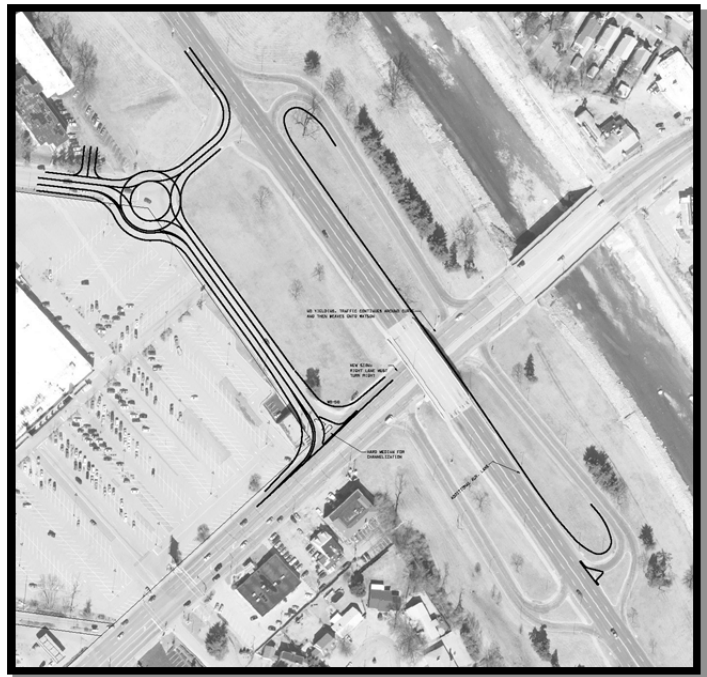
Watson Road – Free Right Turns and Weil Roundabout
